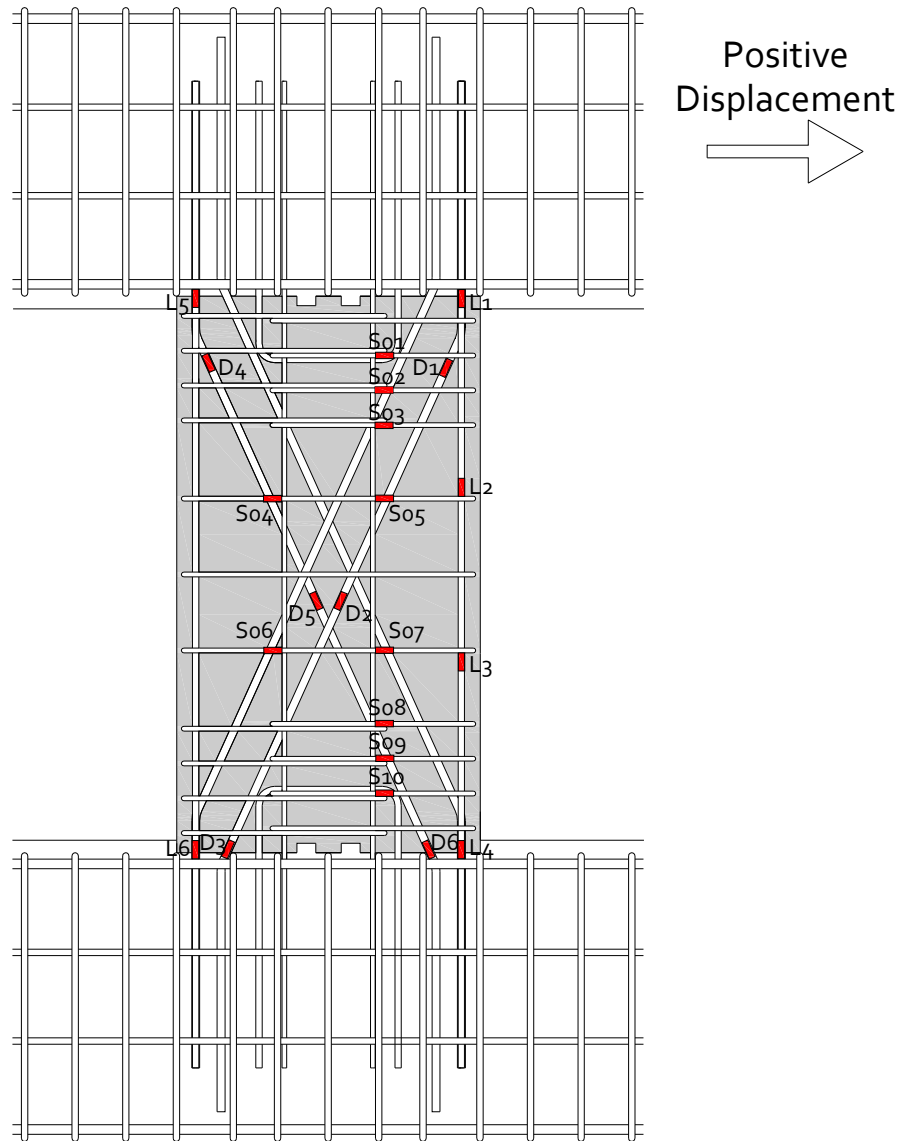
Specimen CB-2 strain gauge layout (gauges D1, L4 and L5 were damaged during casting)
